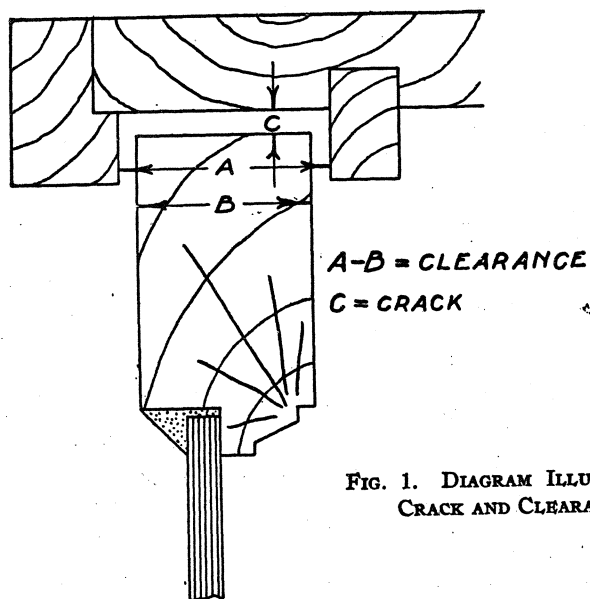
DIAGRAM ILLUSTRATING CRACK AND CLEARANCE
